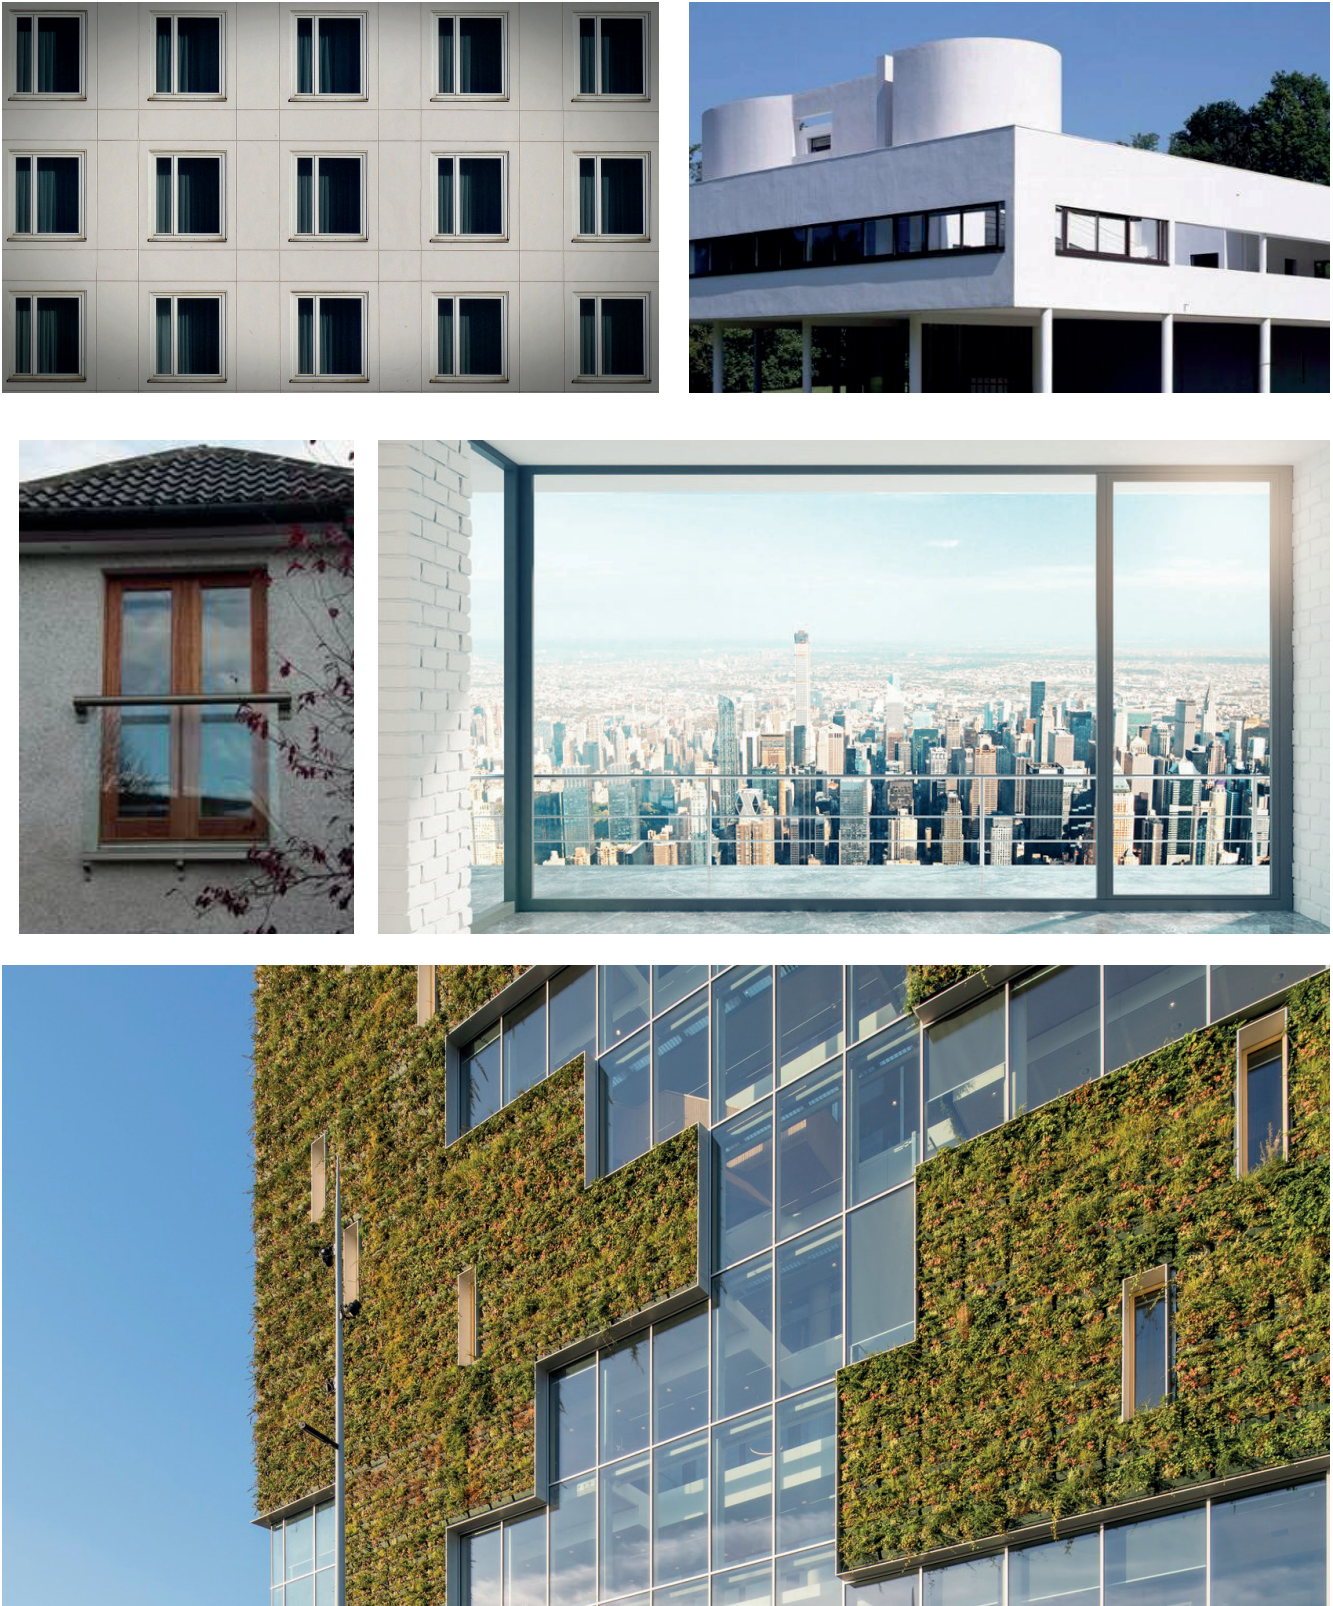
Collection of images of window typologies. Top left: Punched windows. Top right: Window Strip. Center left: French window. Center right: Window - wall. Bottom: Curtain wall. Images by: pixabay.com; france-voyage.com; balconette.co.uk; remi.com; designingbuildings.co.uk
